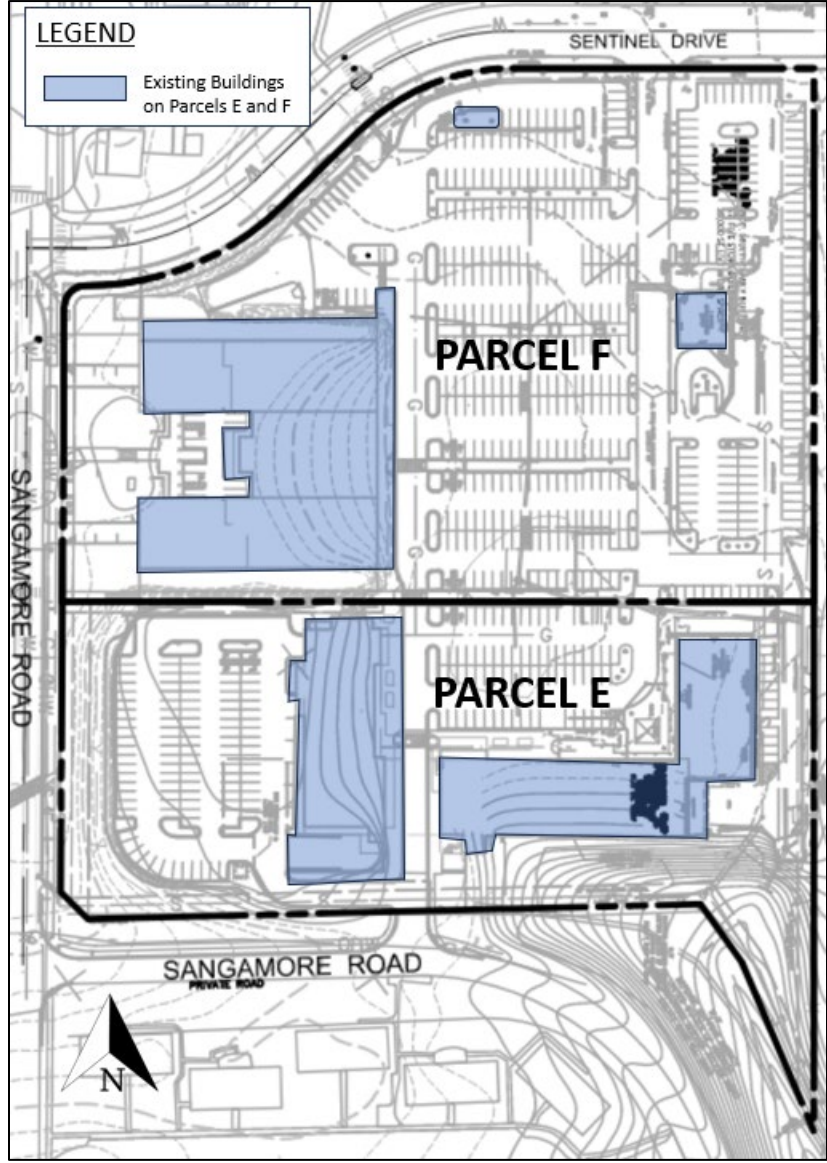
Existing Conditions of the Site. Existing buildings shaded in blue.
